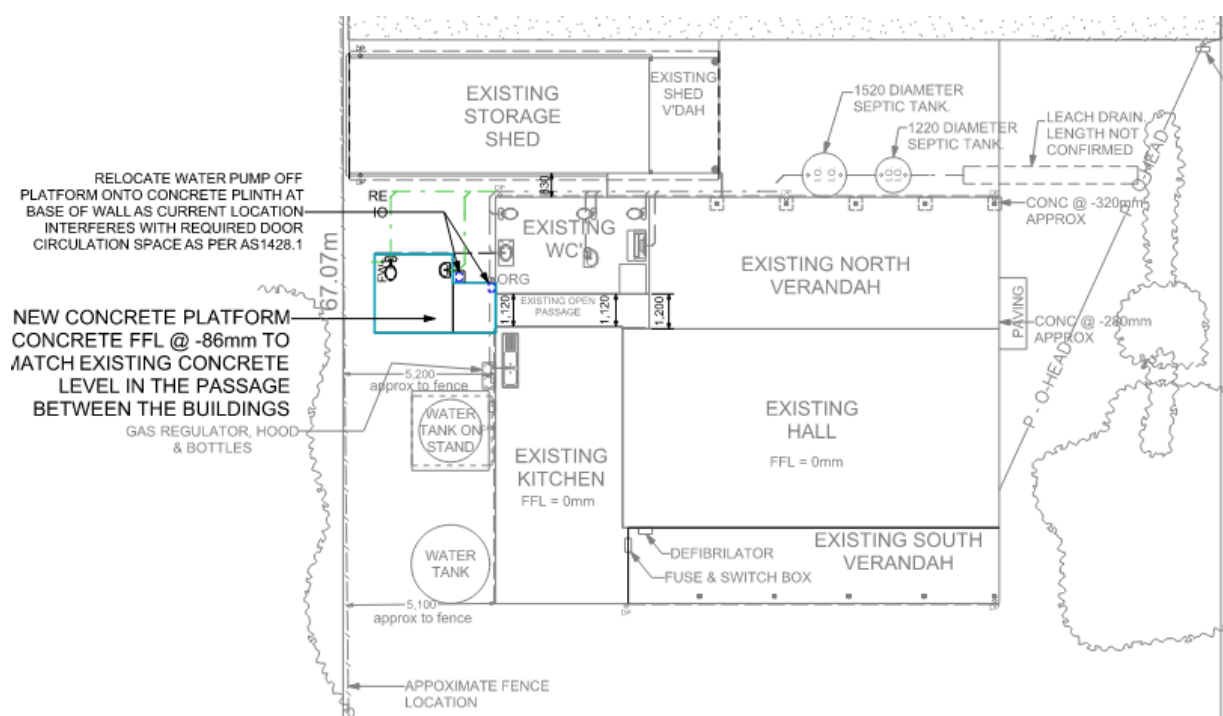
Site plan showing extent of proposed works with reference to existing features
